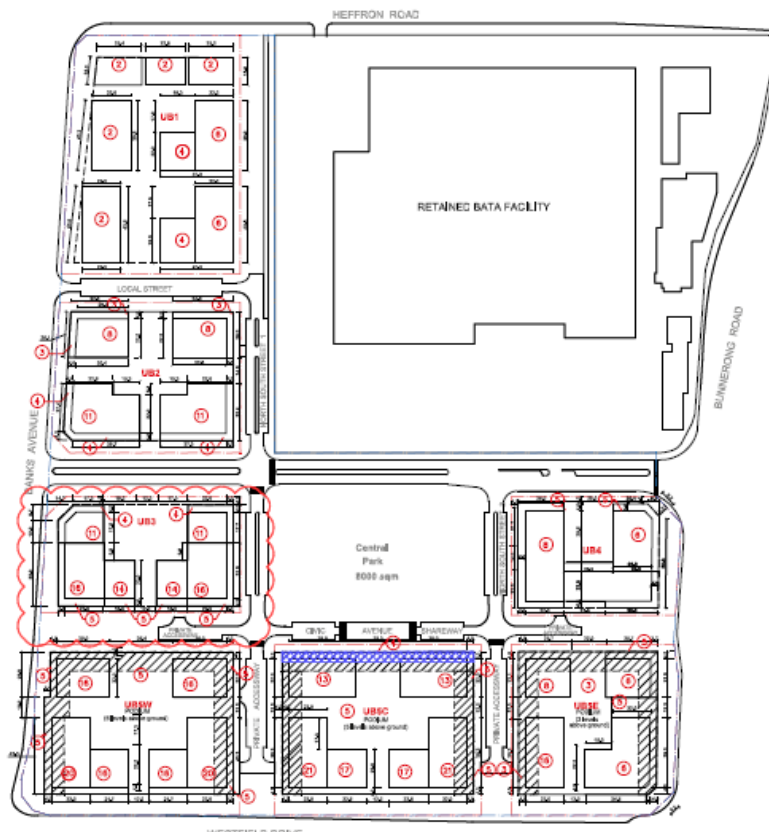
Building envelope plan of the Stage 1 consent determined as part of DA-14/96/07
